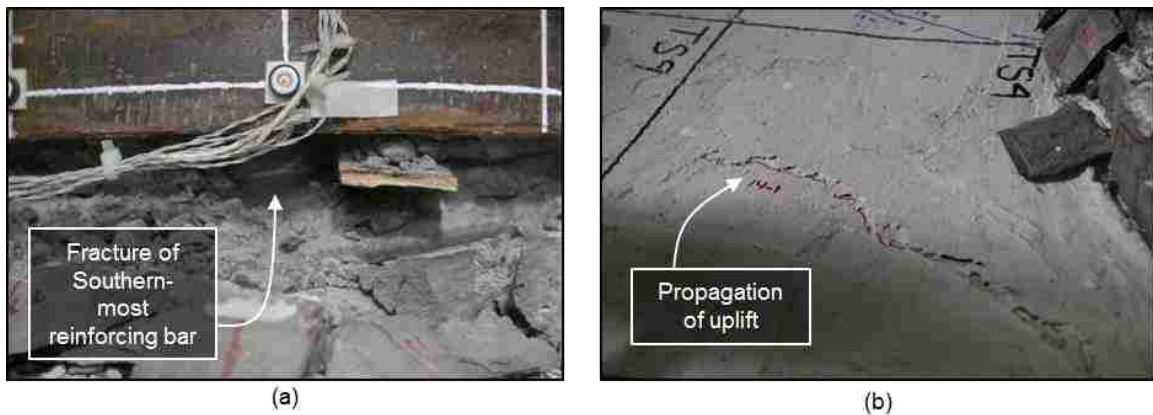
WRC (a) South transverse reinforcing, and (b) North concrete uplift at 8.15% drift
